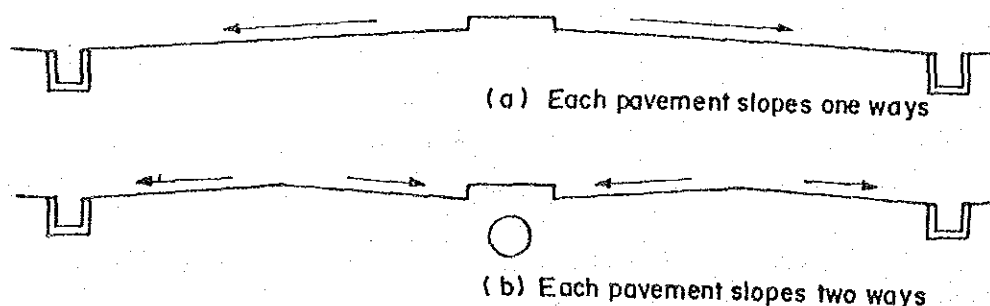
Basic Cross Slope Arrangements for Divided Road
